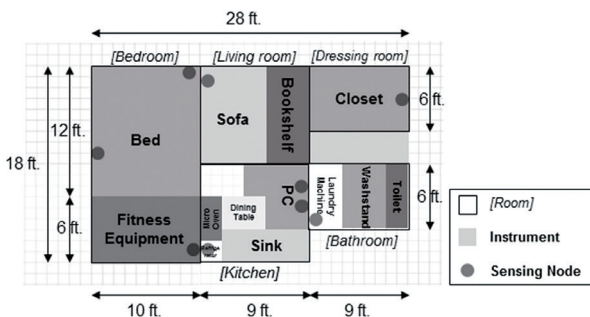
Case Floorplan (Locations of Rooms, Nodes, and Instruments)
